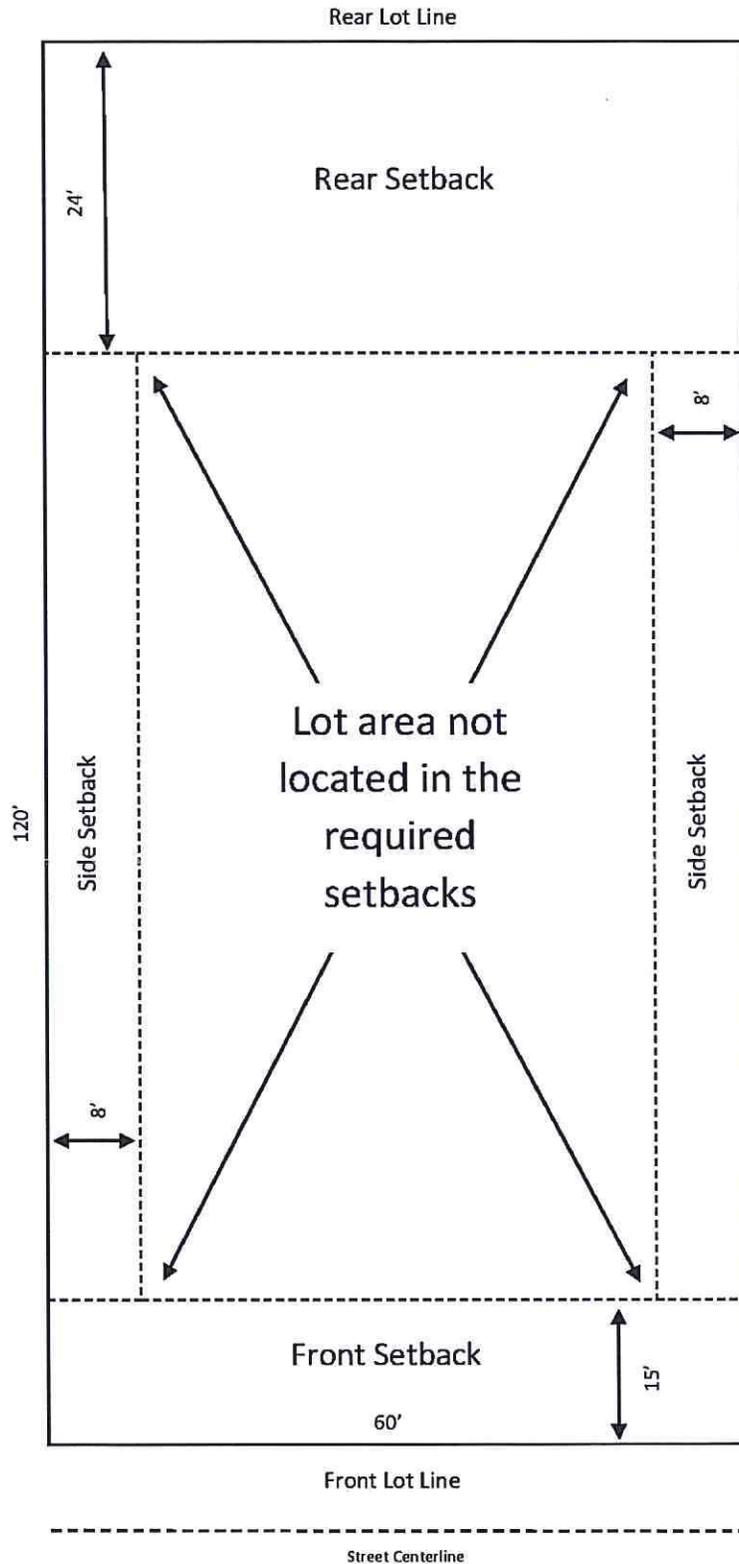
Setbacks (Example using R-1 zone setbacks)
